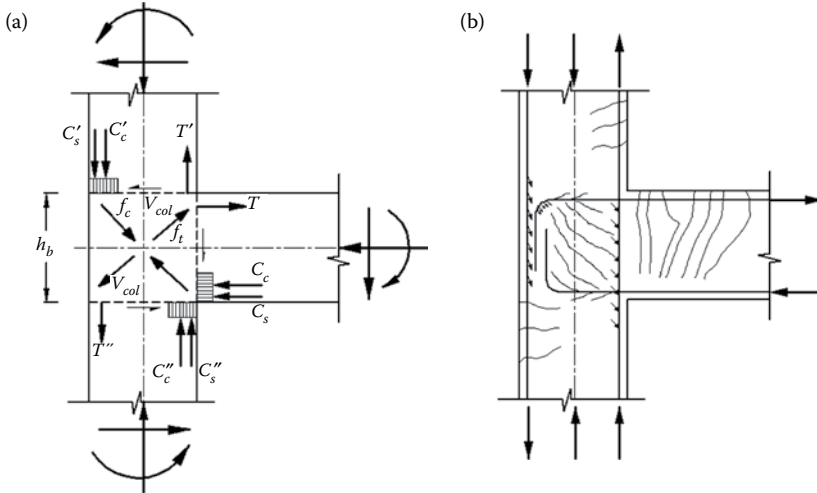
Internal forces and cracking of exterior beam column connection: (a) internal forces and (b) cracking pattern.
